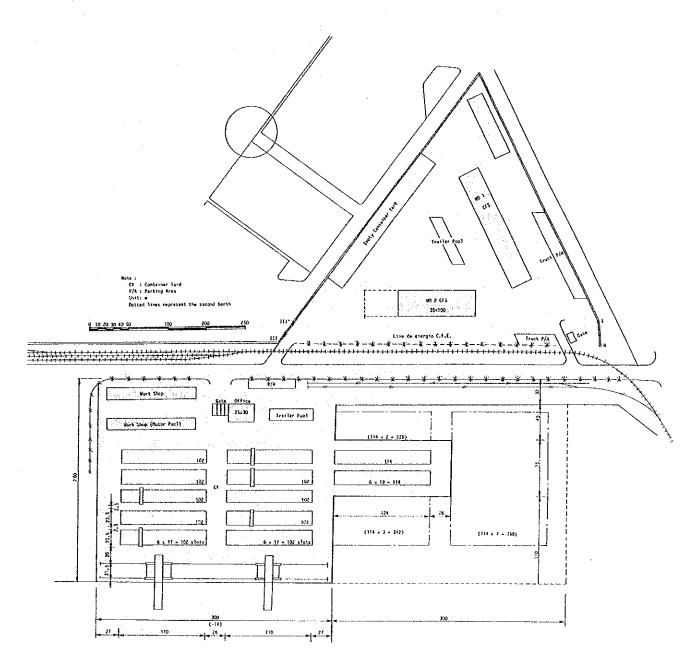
Layout Plan of New Container Terminal - Rubber Tyred
